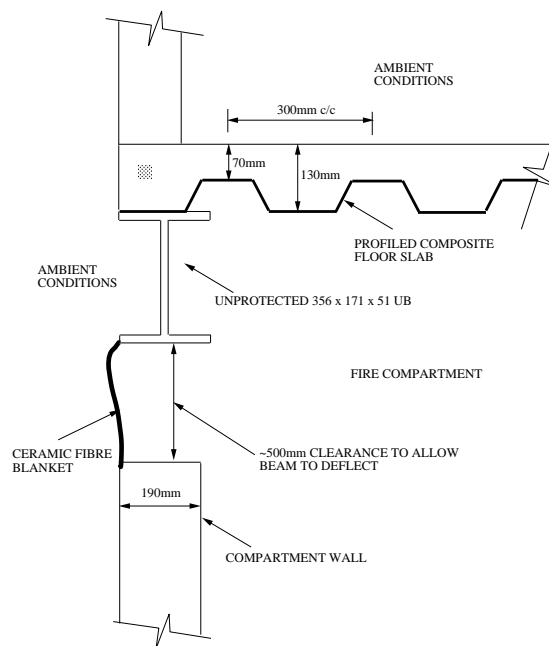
Cross section through an unprotected edge beam in Test 4
